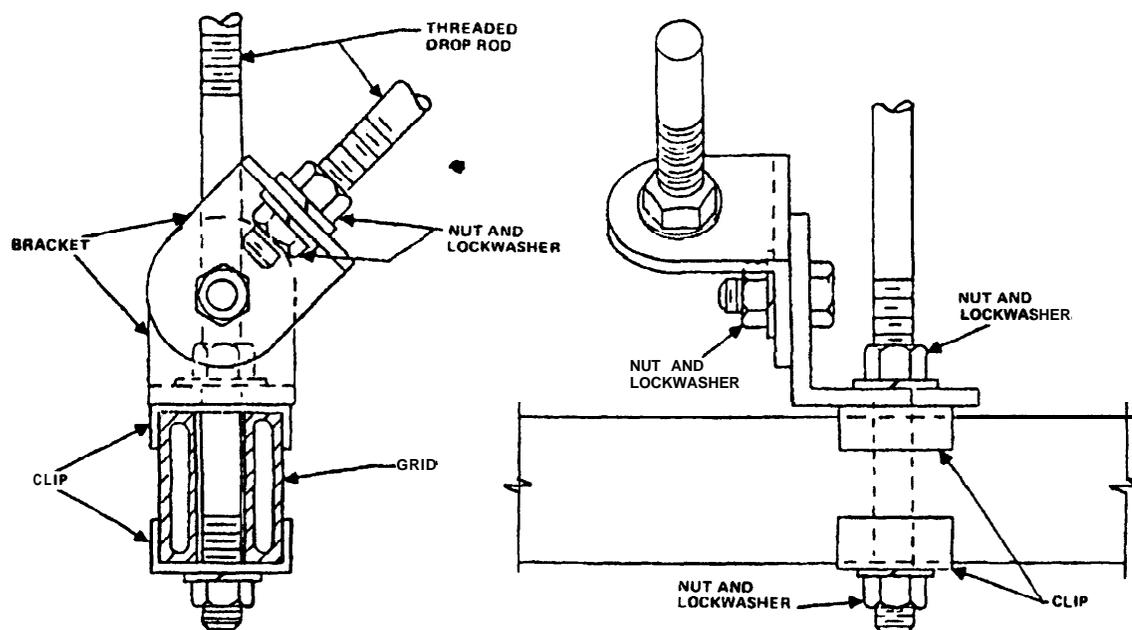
Typical Truss Assembly Lower-Junction Method of Fastening to Cable Grid.
